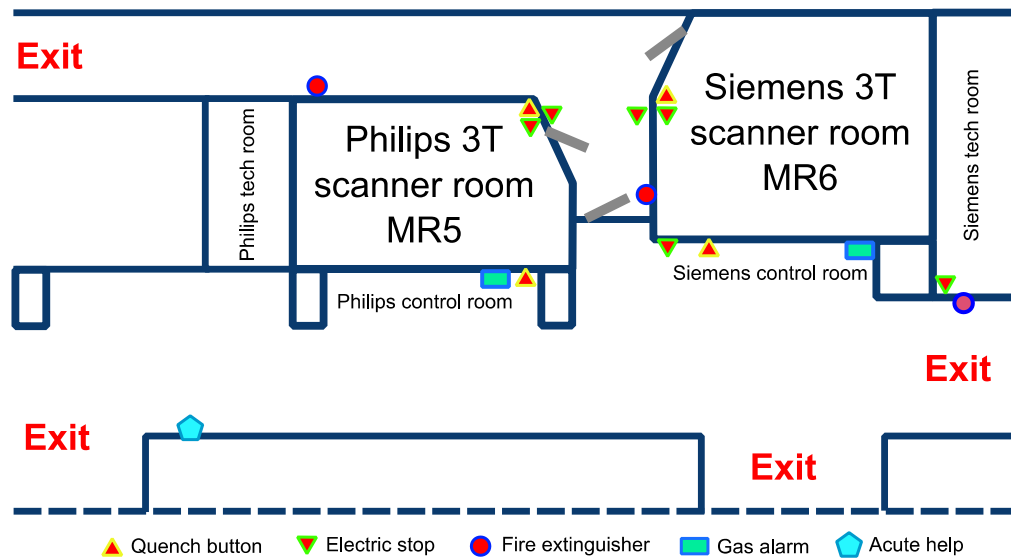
Overview of MR5/MR6 floor plan at CMIV.
